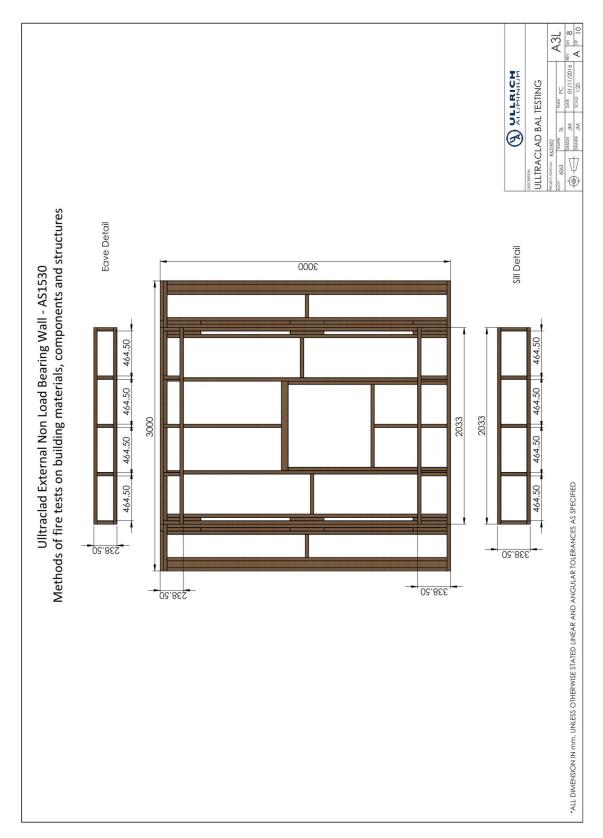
Front frame elevation and Isometric view Drawings provided by client and verified by Exova
